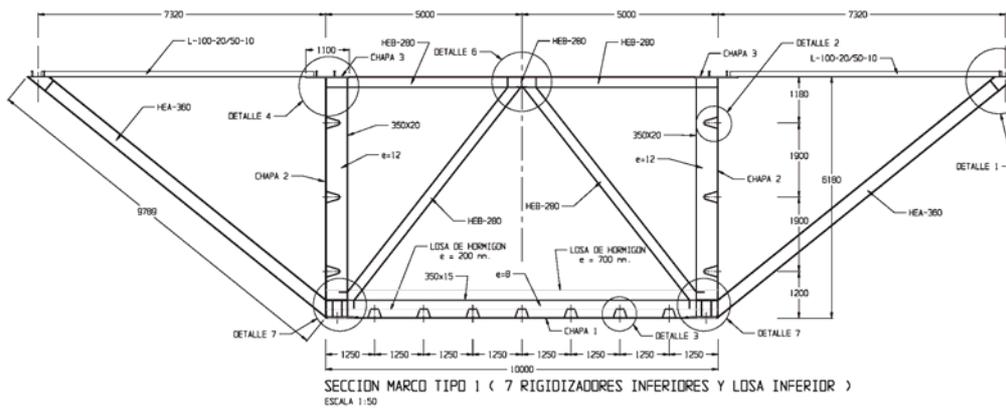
The viaduct of Tina Menor, cross section and detail of the concrete slab in the bottom flange (light grey) to obtain the double composite action for the cross sections closer to the piers [56].
